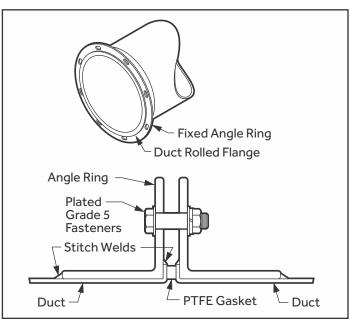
Fixed angle rings 32" - 120" (812.8 - 3048.0)
